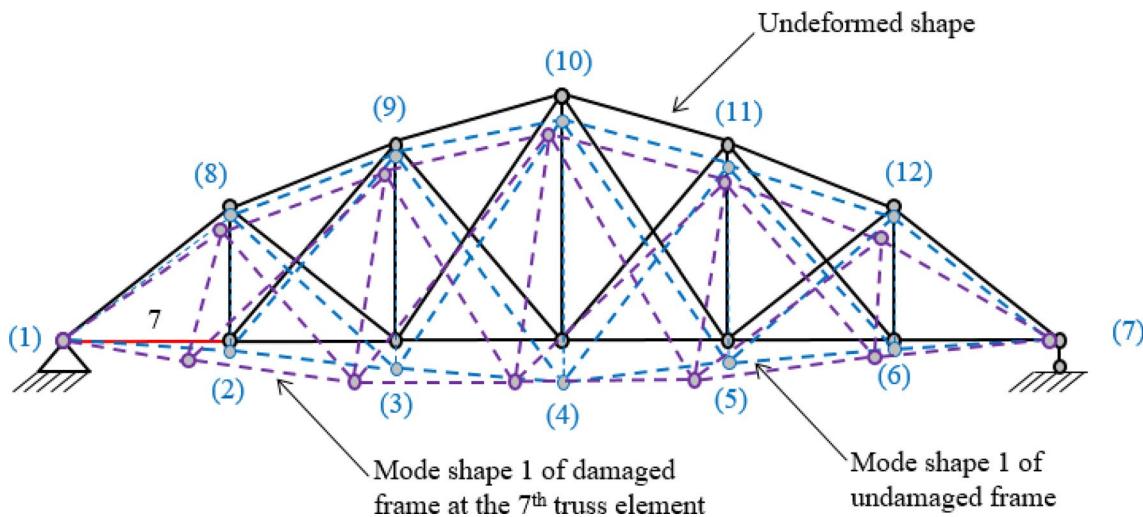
Compared mode shape 1 of the damaged and undamaged truss bridge structure
